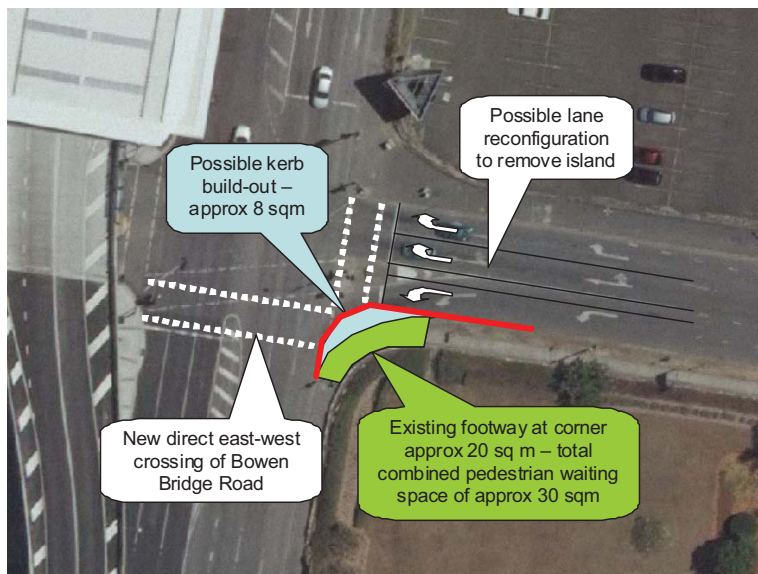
Possible enhancement to pedestrian waiting zone at corner of O'Connell Terrace and Bowen Bridge Road
